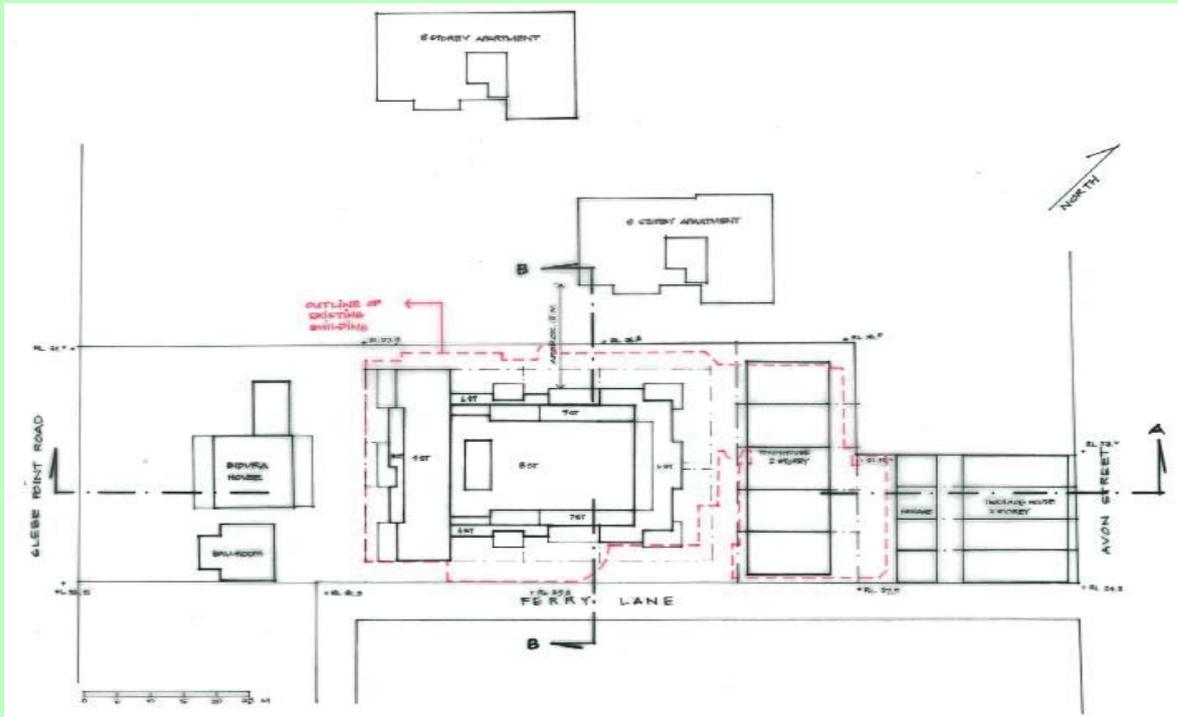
Site Plan of preferred Building Envelope (Giles Tribe Architects)
